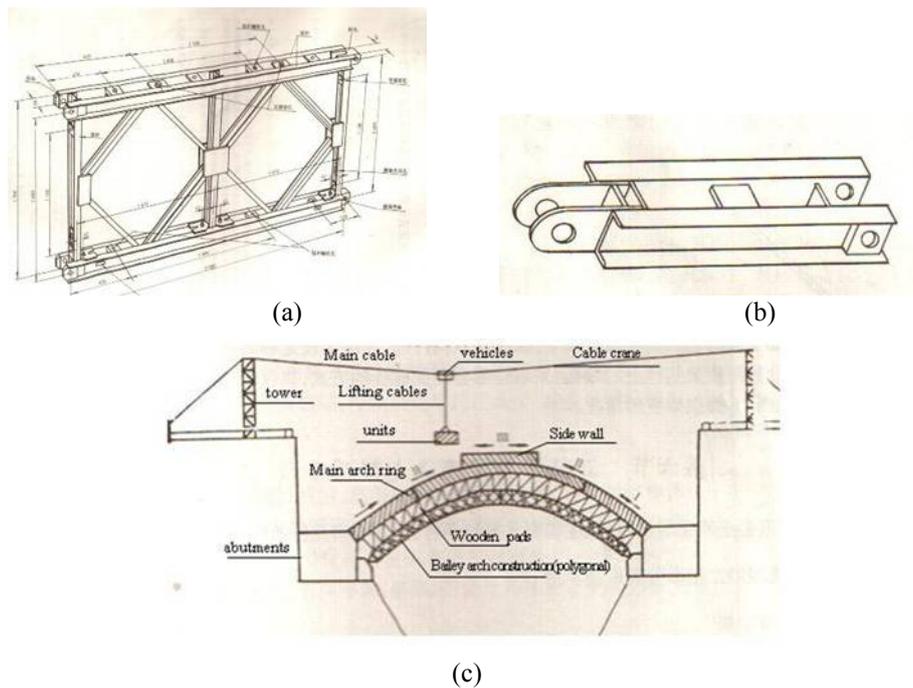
Bailey arch construction in Guangdong Province:(a) Military prefabricated "Bailey truss beam, (b) Special component as a joint, (c) Schematic diagram of casting the main arch ring on Bailey arch construction
